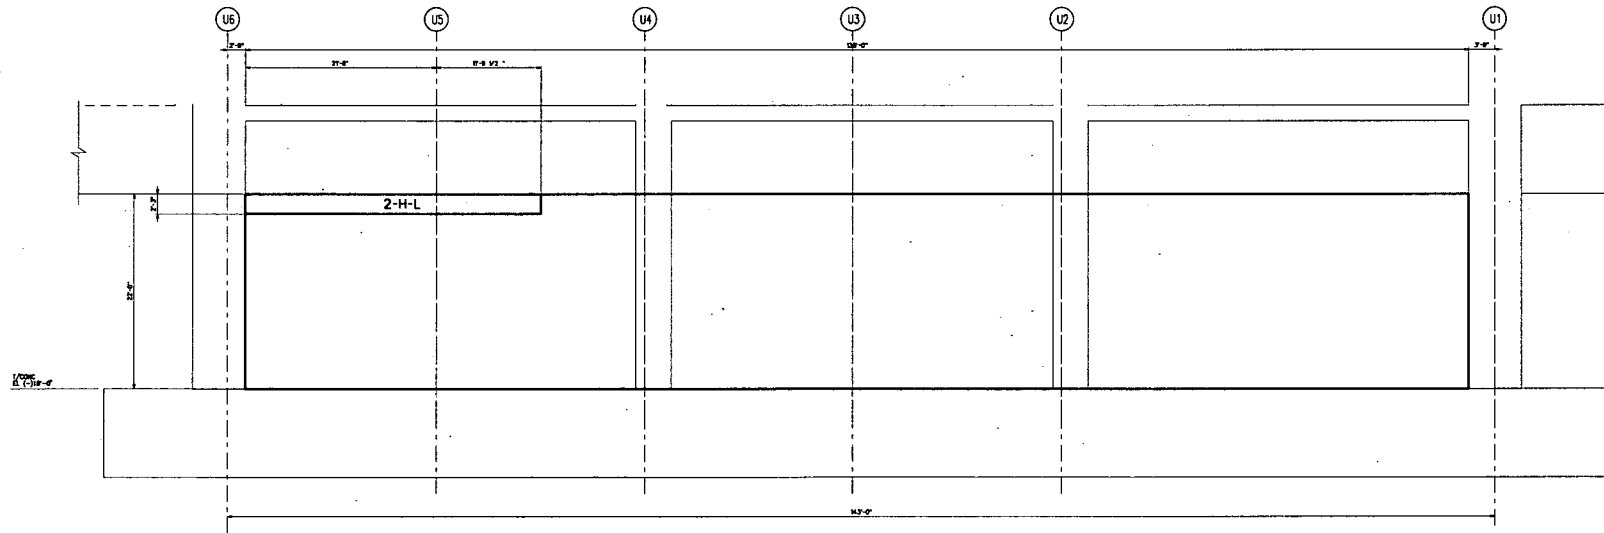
H.6-61: PLUMPHOUSE EAST WALL LOOKING WEST
